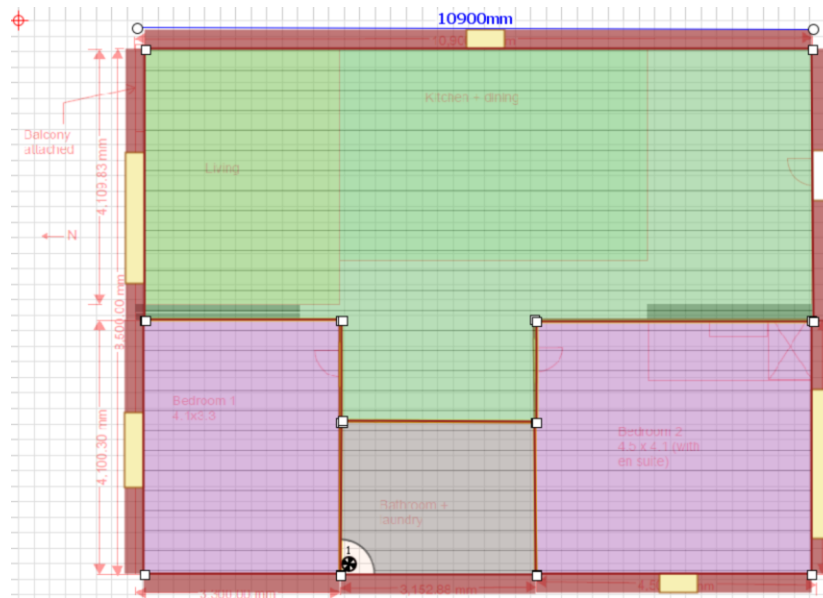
B: Floor Plan Modelling in First Rate 5.
